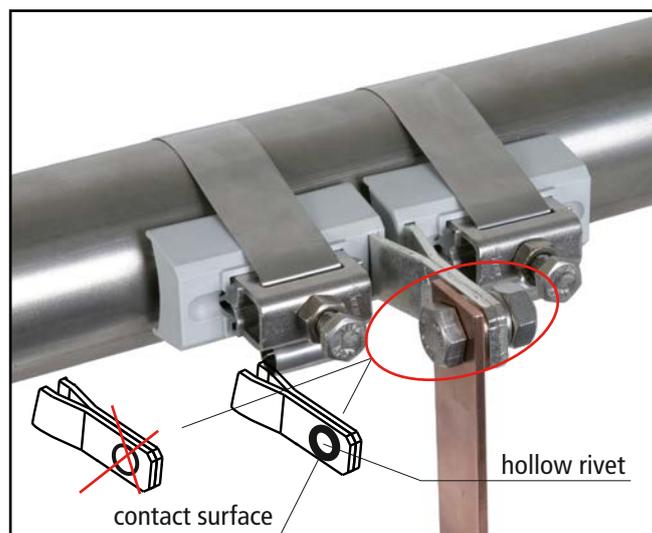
b Flat conductor with hole (Ø 10,5 mm)
